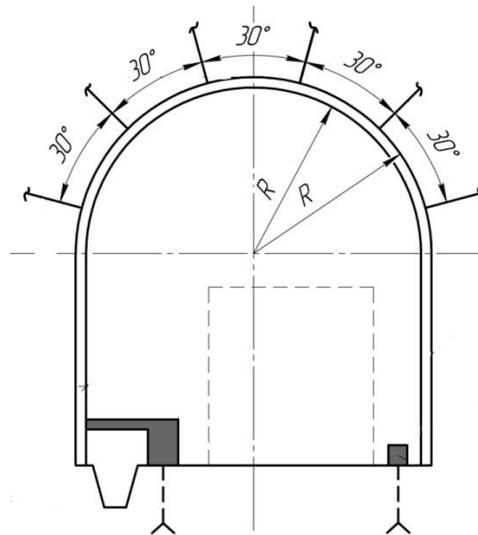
Fixing the tunnel arch with sprayed concrete and anchors
